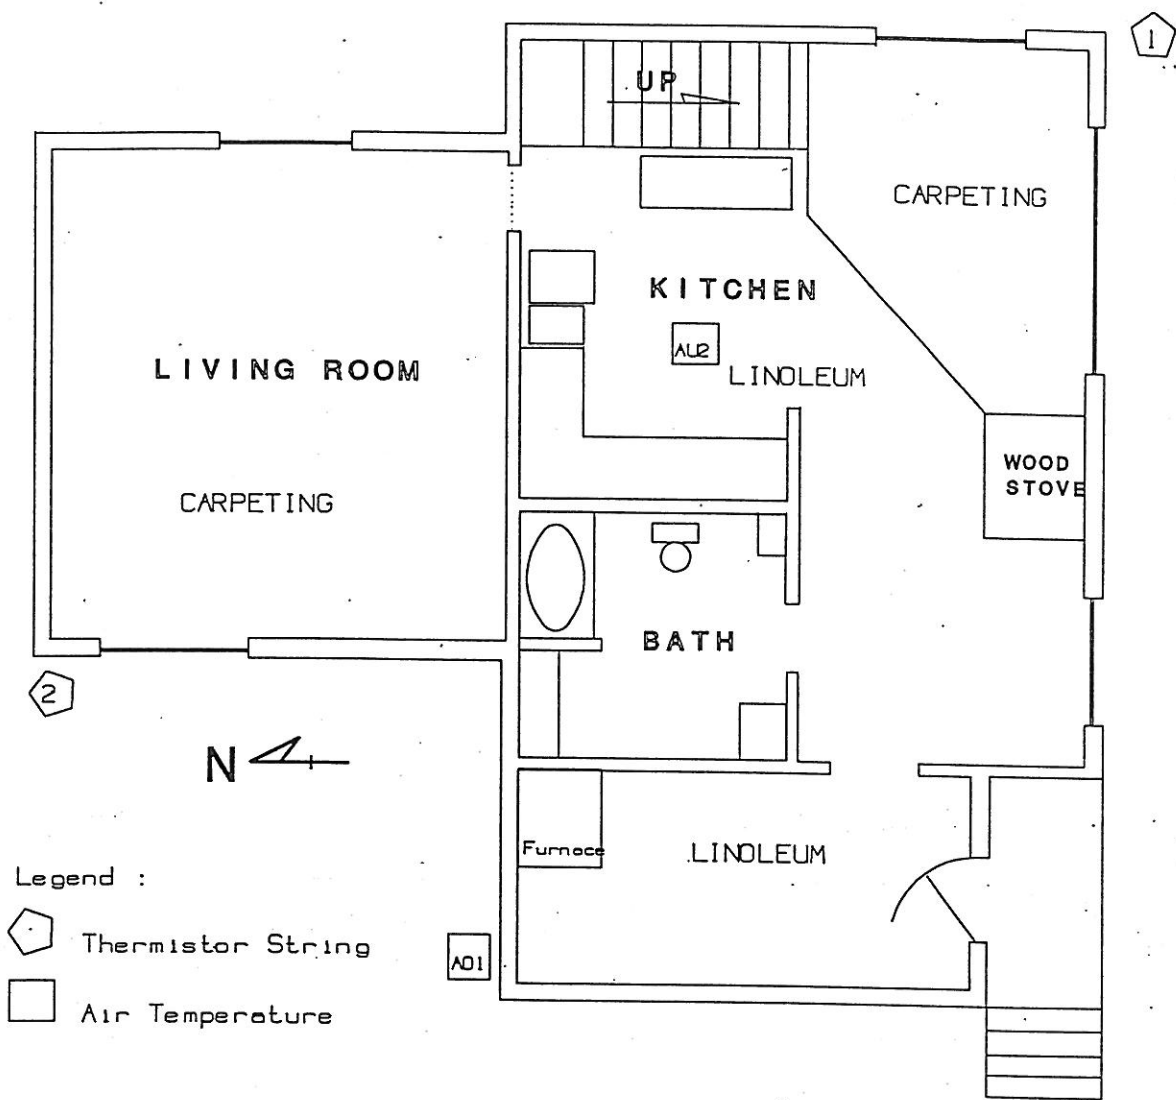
FLOOR PLAN OF HOUSE ON JONES RD.
